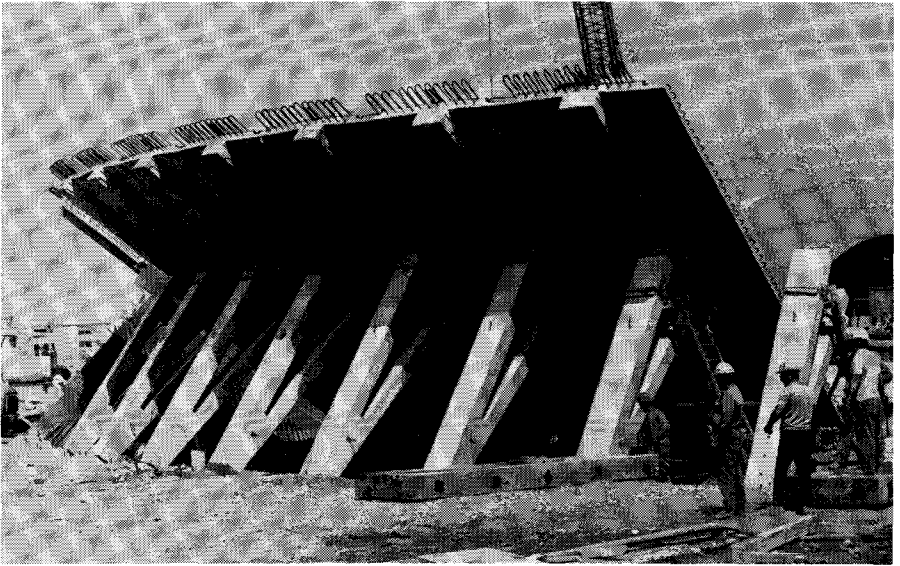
Lower cone elements showing slanted precast V-columns and precast tee slabs.
